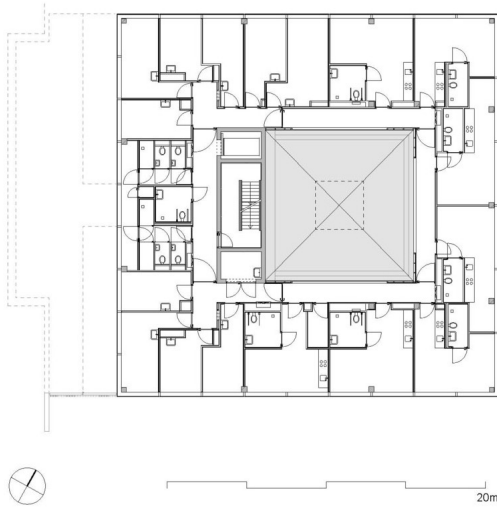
the atrium floorplan [Archdaily, n.d.]
